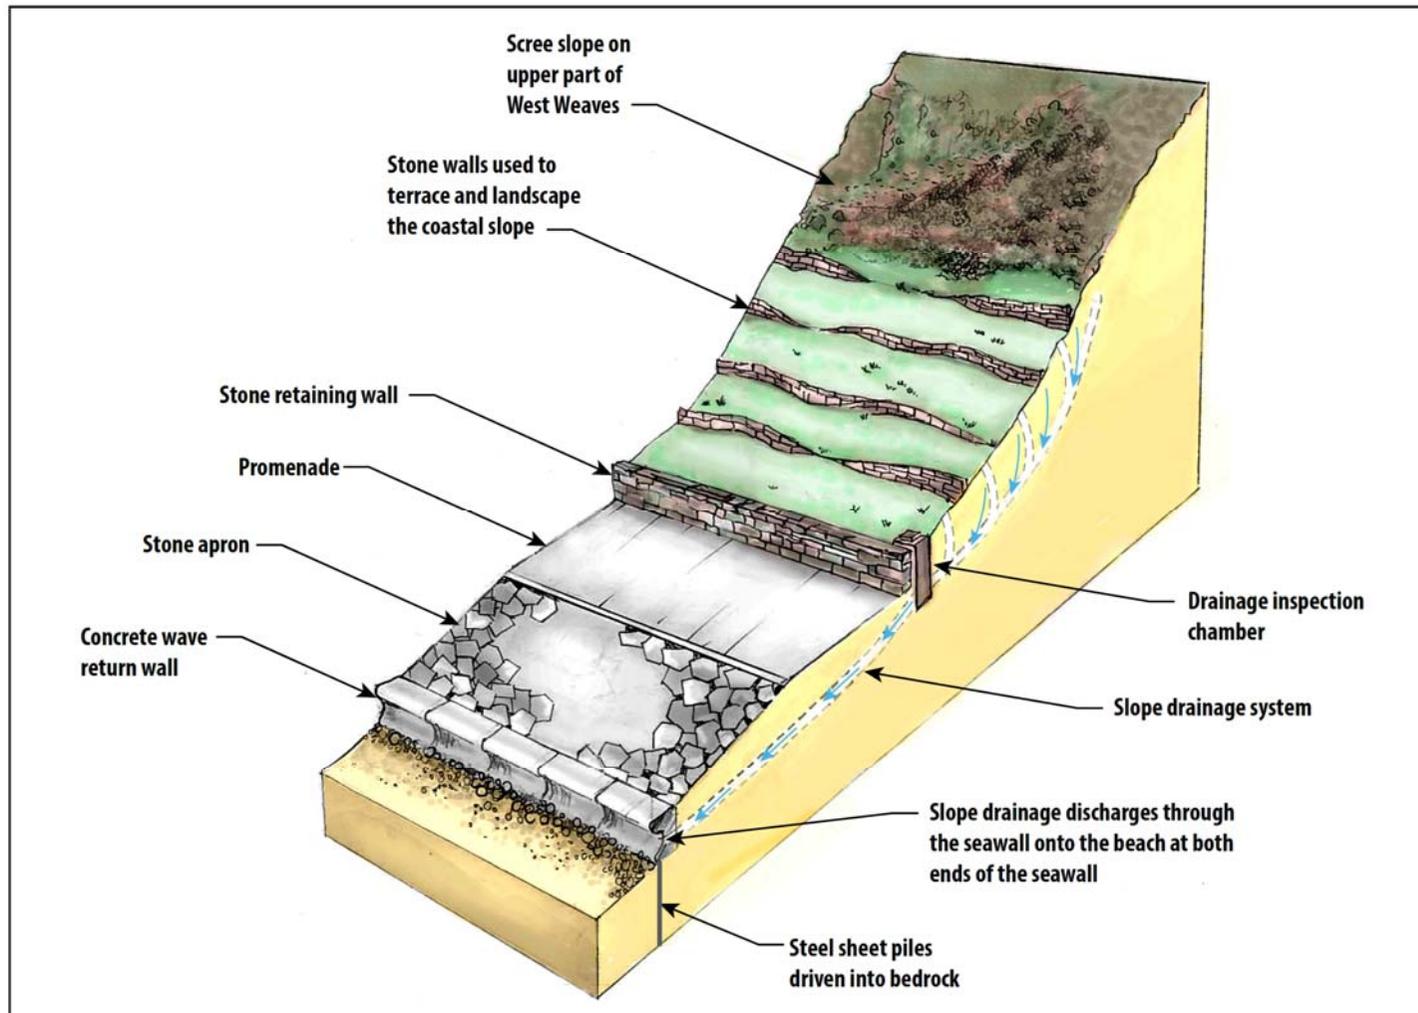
Typical section through the seawall and slope stabilisation measures at West Weares in MU1 (along cross-section A with reference to Figure 3.2 above). NB: copy also provided in Appendix P.
